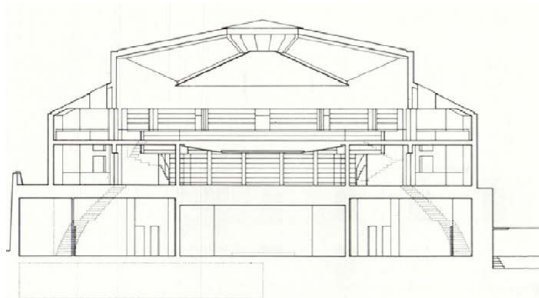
Section and view of the reading room of the Library of Puerta Toledo.
